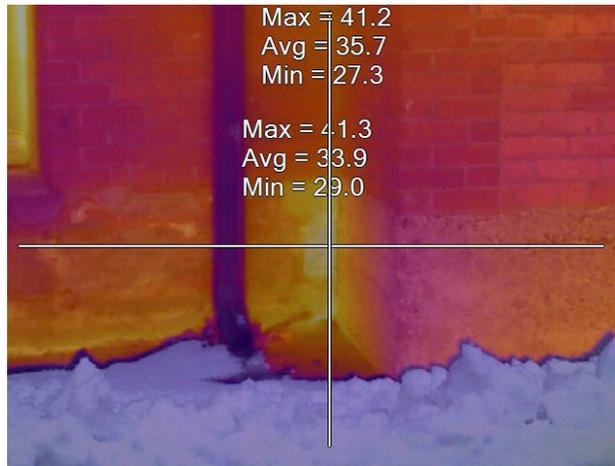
IR000199.IS2: Thermal image of apparent crack in a corner on the south side of the building.
